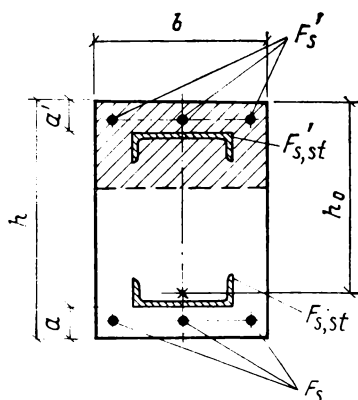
To the design of eccentrically loaded members with stiff reinforcement in the compression and tension zones
